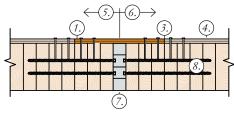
Prefabricated NLT Panel Sheathed On-Site
